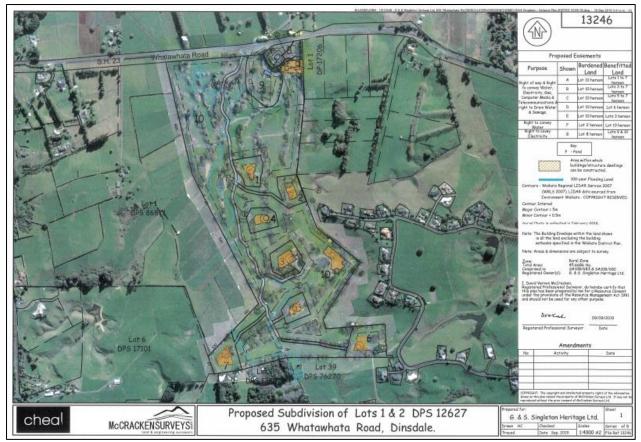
Annotated Scheme Plan showing proposed restricted building areas.
